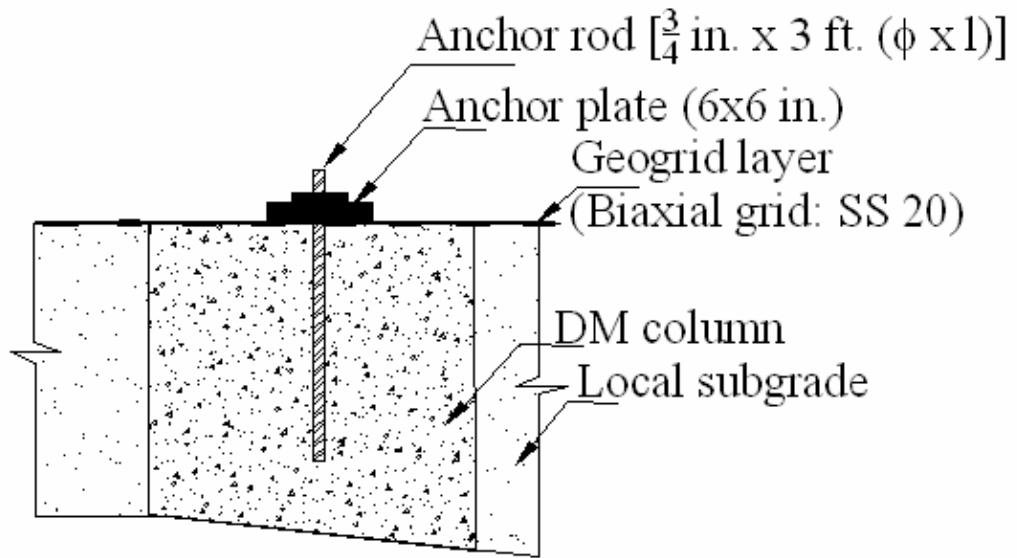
Details of anchor rod, plate and geogrid connection to the DSM column (Detail A)
